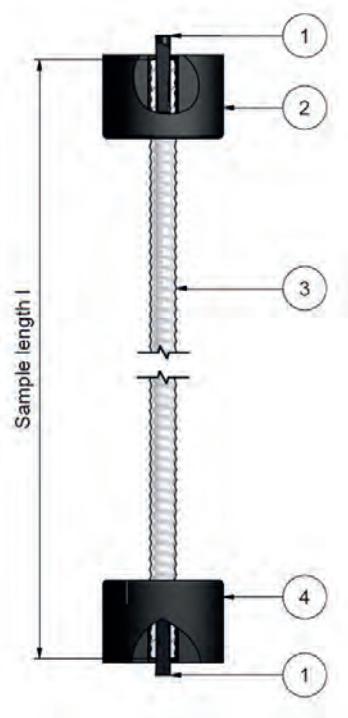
Example of a tensile test assembly for tendons. (1 plugs, 2 clamping top, 3 tendon, 4 clamping bottom).
